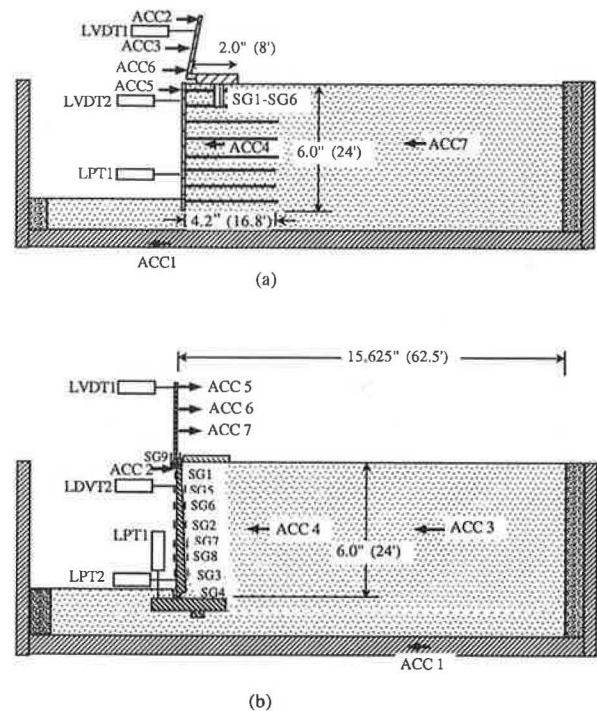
Test arrangement and instrumentation: *a*, MSE and *b*, Type 1 retaining wall models.
